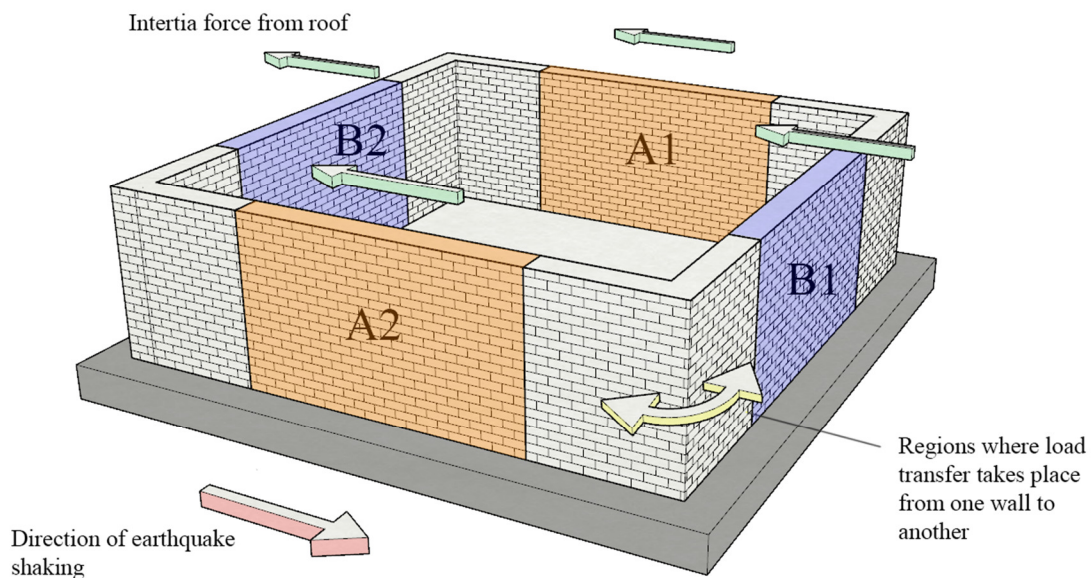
Example of force transfer from weak walls to strong walls in a CSEB building.
